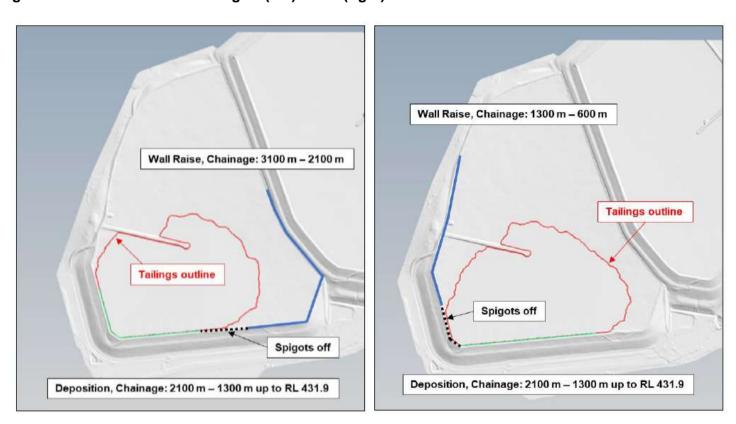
Cell 3F construction stage 3 (left) and 4 (right)
